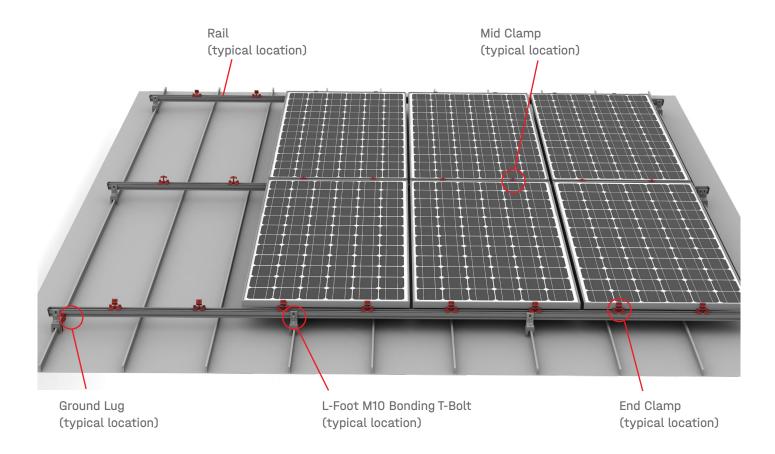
Bonding connections shown in red. For certain jurisdictions, bonding and grounding connections are identified at typical locations.
